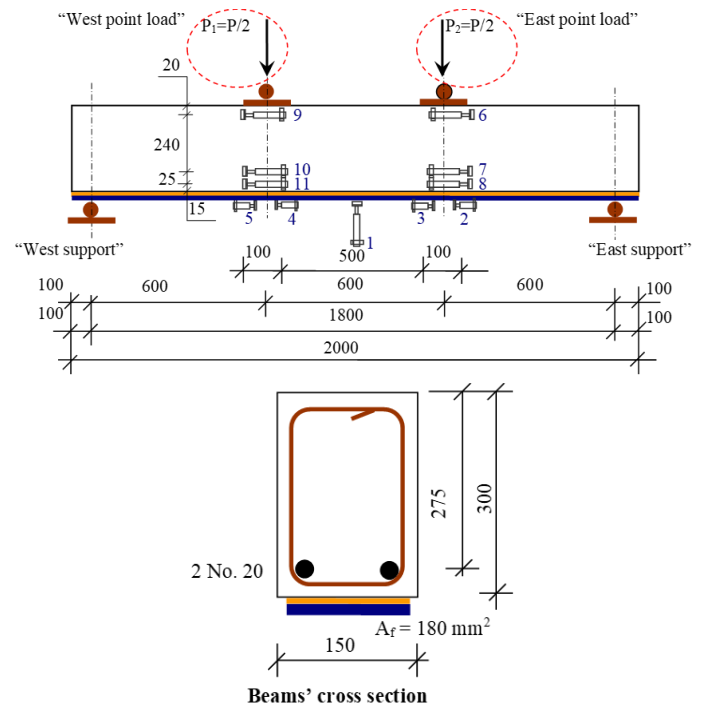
Instrumentation of the tested beams and cross section of the tested beam.
